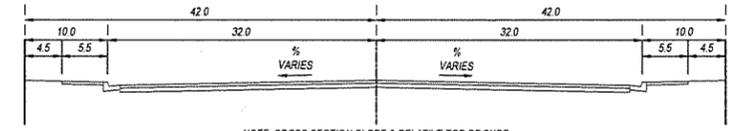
DETAIL: SOUTH NARDO AVE (SNA) CURB RETURN INTERSECTION
